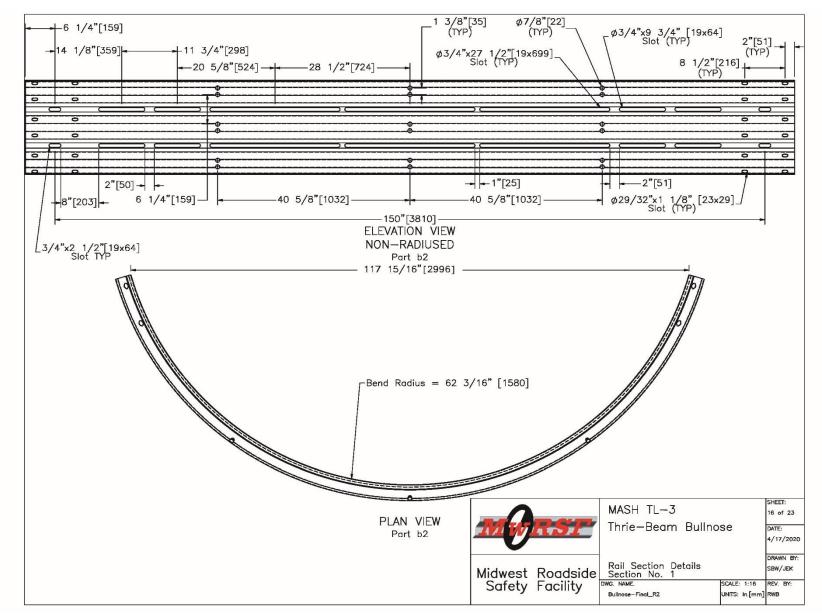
Rail Section Details, Section No. 1, Bullnose Final
